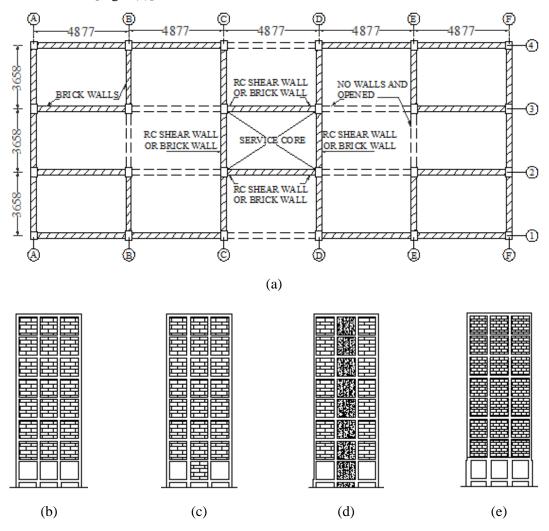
Plan and sections of the buildings: (a) Plan, (b) Section C-C of MODEL-1, (c) Section C-C of MODEL-2, (d) Section C-C of MODEL-3, (e) Section C-C of MODEL-4. All dimensions are in mm.
